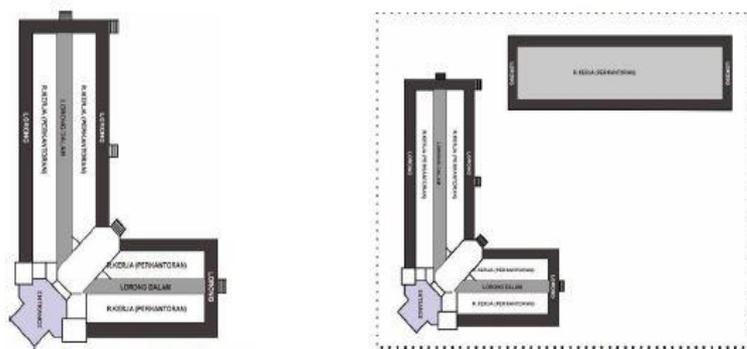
Plan Lawang Sewu 1904-1907 1916-1917
